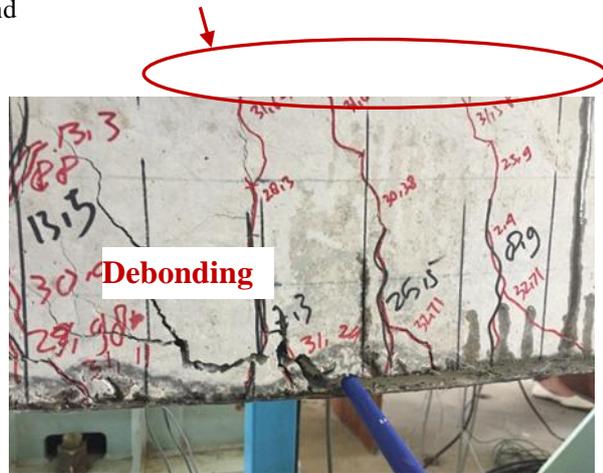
(b) shows typical of failure for strengthened beams. The beam failed by intermediate flexural crack induced interfacial debonding (IC debonding). The IC-debonding caused premature failure of the strengthened beam and it can significantly limit the capacity enhancement and prevent the full ultimate flexural capacity of the strengthening beam. At the failure, the U-shape straps did not rupture. Moreover, Fig. 11 also indicated that by strengthening the beam using GFRP sheet, the beam flexural capacity is increased and therefore more number of flexural cracks are occurred and developed towards the neutral axis before beam failure.
